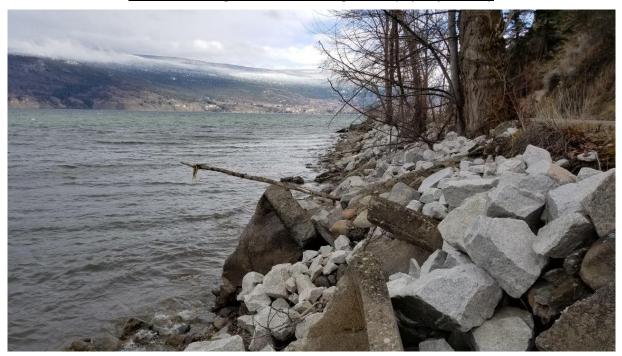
Segment #5 - Looking North (RipRap Armor)
